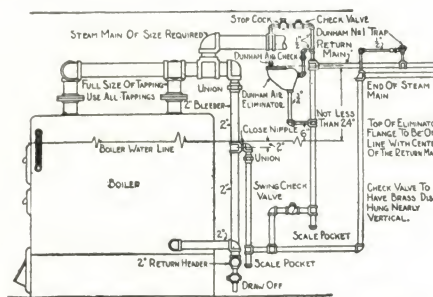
C. Method of Installing Eliminator Type 220B on Installations Using Boiler with Two or More Supply Tappings
